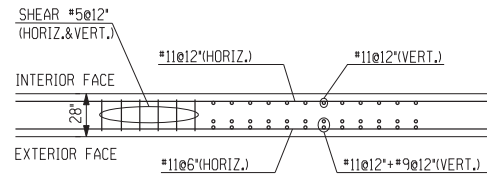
Typical Reinforcement in R/B West Common Wall – SECTION 1
